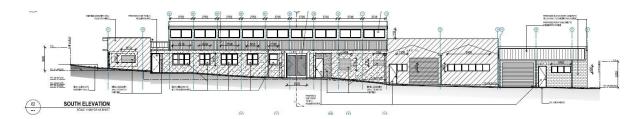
South Elevation Plan (Source: Ace Simonovski Design Studio)
